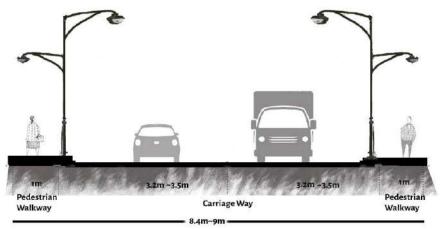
The proposed cross-section for the road stretch of Ella – Wellawaya road falling outside the limits of Ravan City
